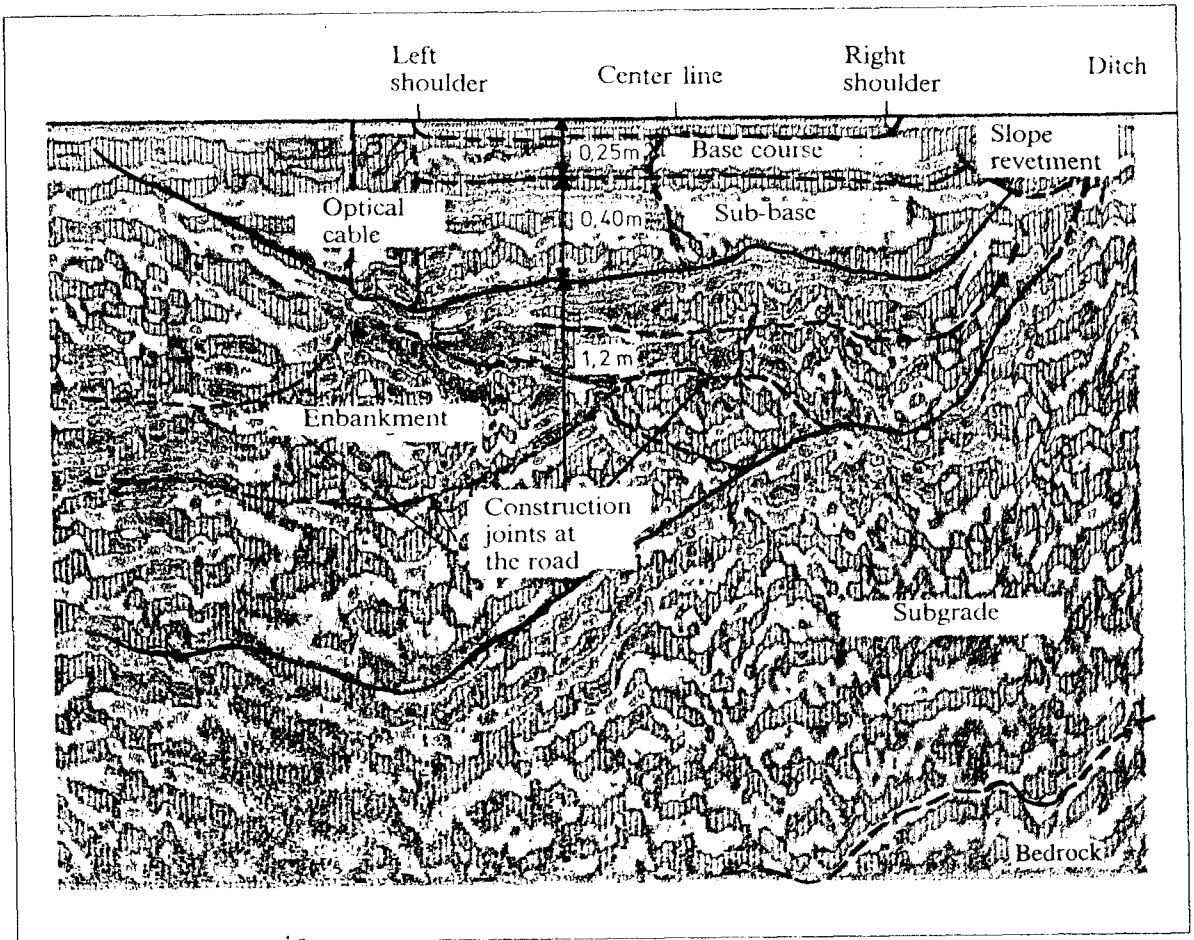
Cross-section of a road constructed on a laterally gradient slope, Highway 83 at Ritavalkea, Pello. Structural courses, road embankment and subgrade can be interpreted from the profile. Construction joints of the road, and the ditch excavated on the left-hand shoulder for optical cables can also be seen on the profile. 500 MHz antenna, measurement time (range) 55 ns.
